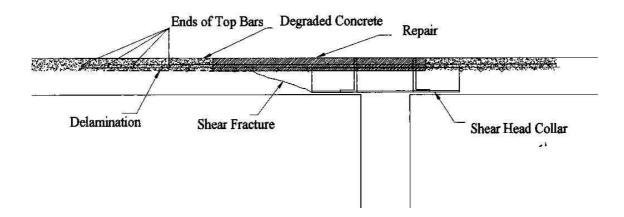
1 Marking of degradation depth and shear fracture plane on Section of H2
